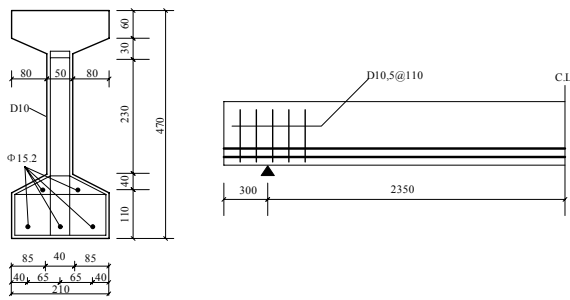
Section and geometrical dimension of specimen 1 and specimen 2
